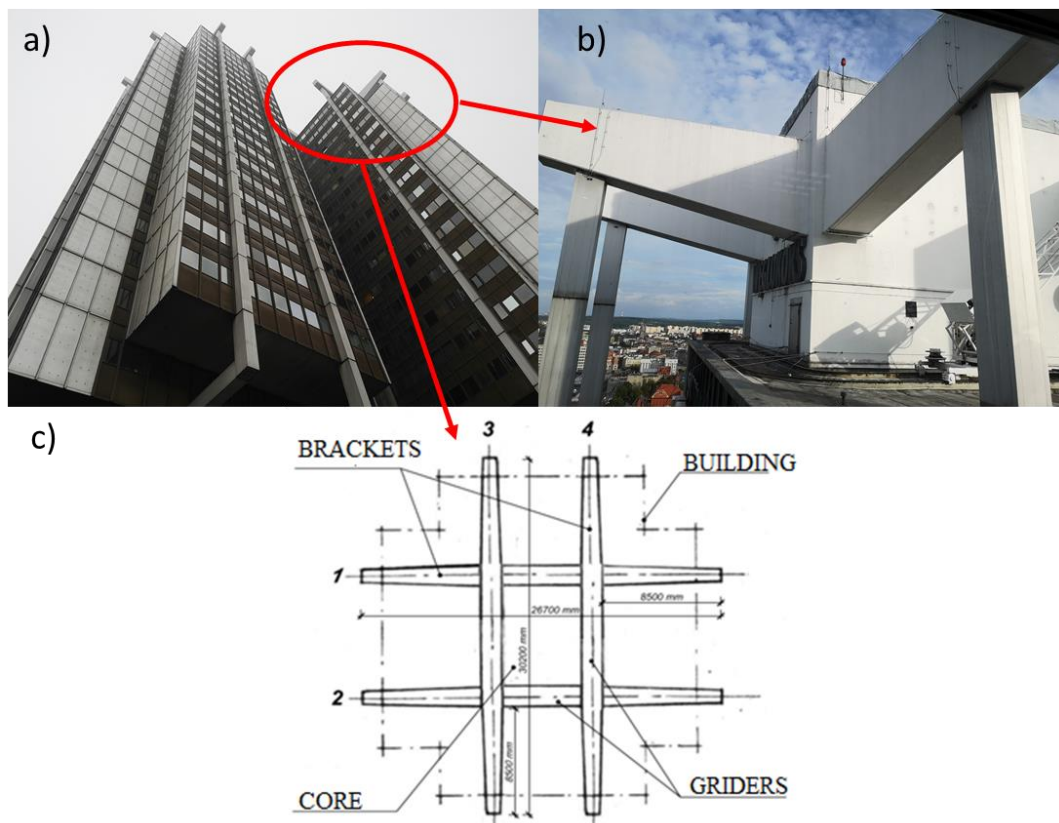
General view of the building (a) view of the post-tensioned concrete load bearing structure (b) diagram of the reinforced concrete load bearing structure consisting of four girders (c).
